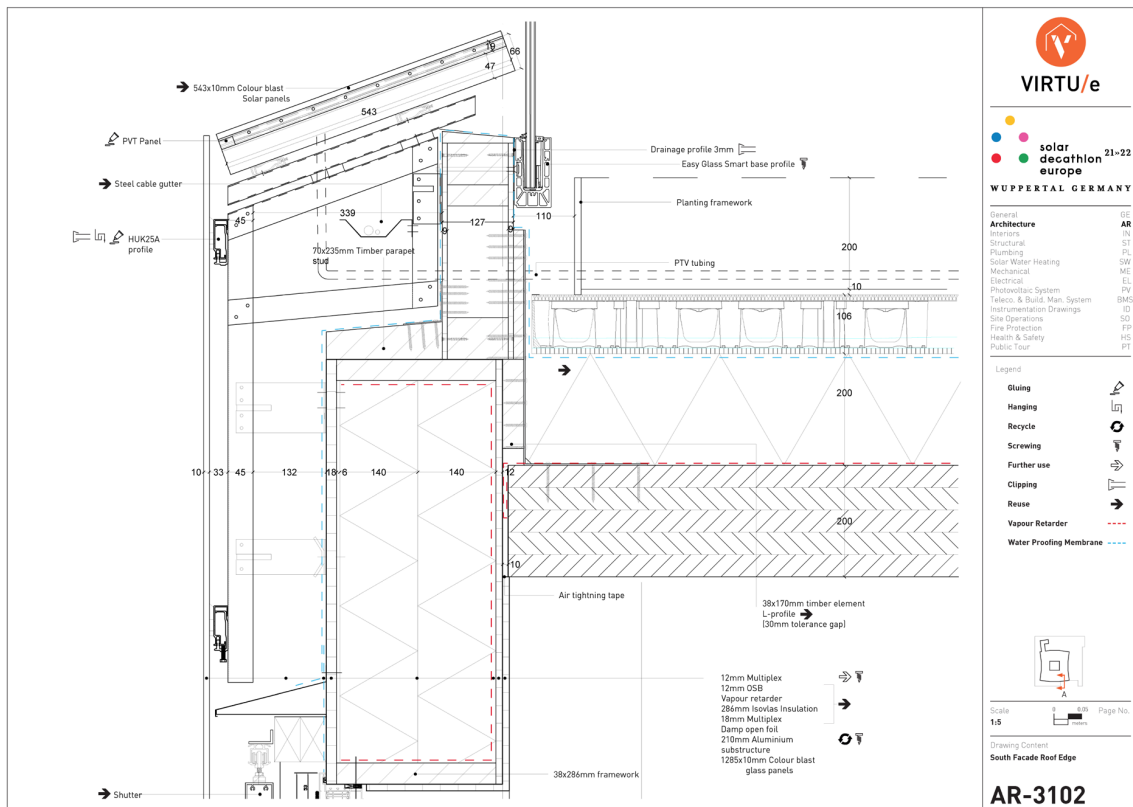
A detail drawing of the solar belt of the RDU. It shows the tilted PVT panel in the roof edge and the glass railings.
